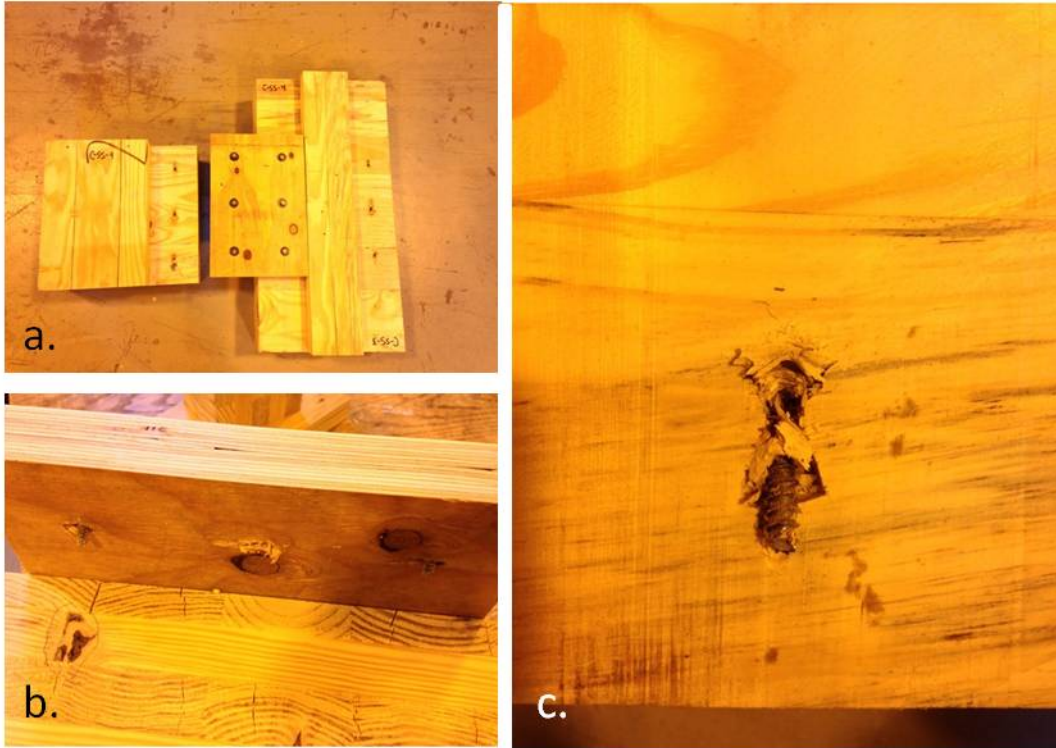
Observed Fastener Failure in Cyclic Spline Specimens
